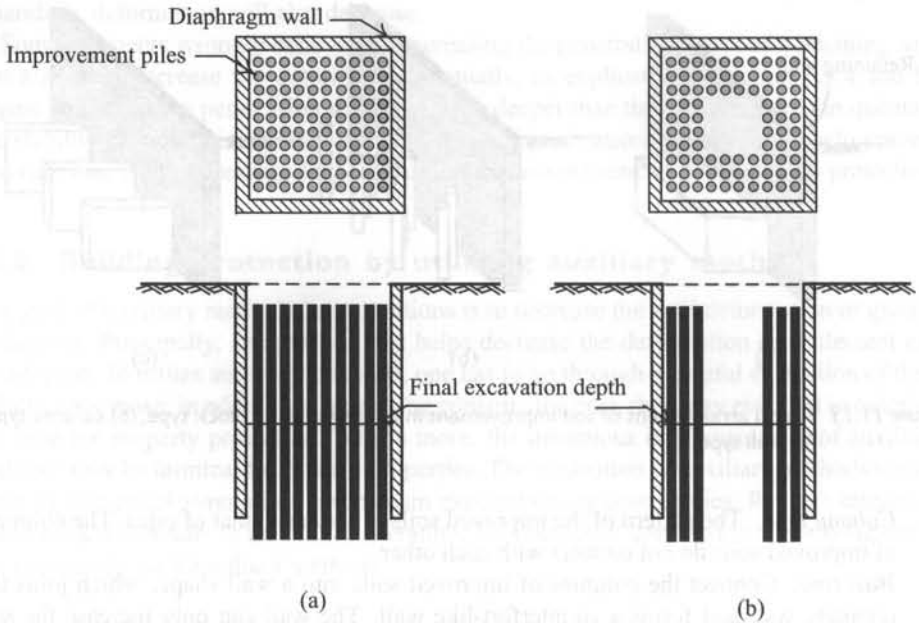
Soil improvement within excavation zone: (a) improvement over the whole zone and (b) partial improvement.
